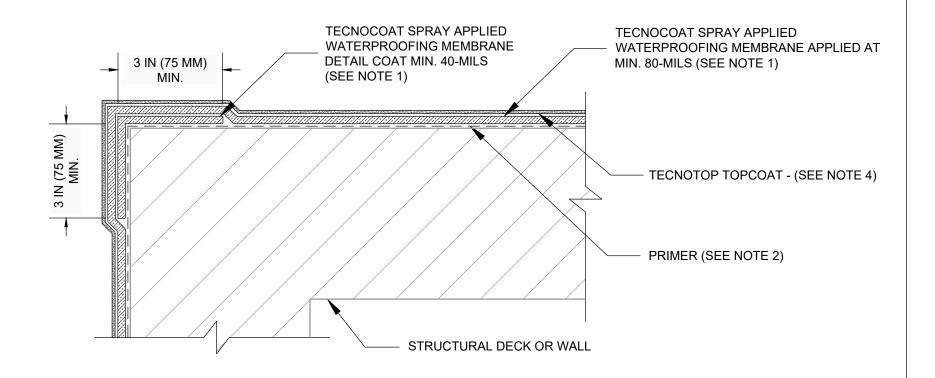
DETAILS ARE INTENDED TO BE A GUIDE FOR WATERPROOFING INSTALLATION ONLY
